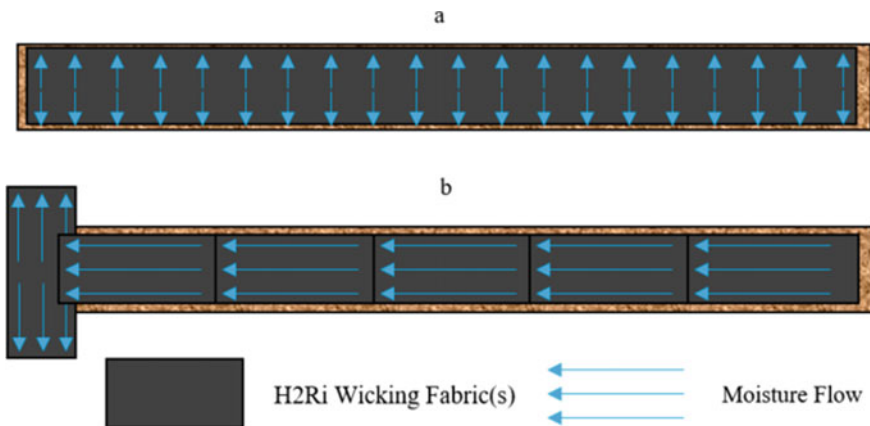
Conventional wicking fabric installation (a), compared to installation used in this study (b)
